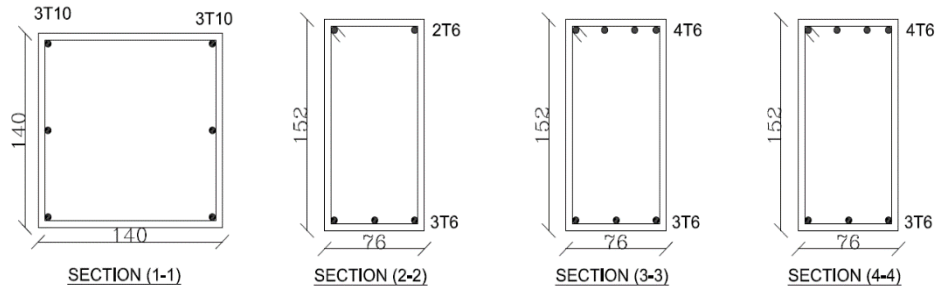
Cross Sections of Columns and Beams of the 2-D , 2-Story Frame [19] (All Dimensions are in mm).
